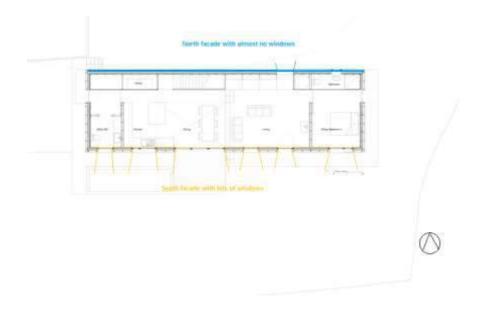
Ground floor plan of the Ty Pren house (Pren 2011)
